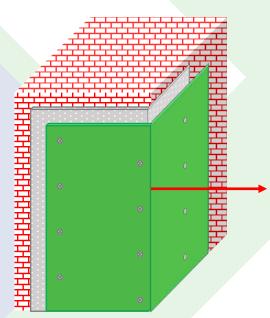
Cross sectional diagram of membrane installation around window, door frames and other such openings.
